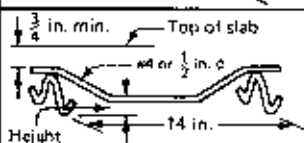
Placement of reinforcing steel. (Courtesy of Concrete Reinforcing Steel Institute)
